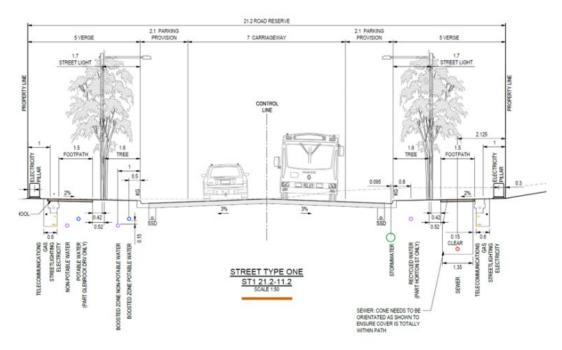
Proposed road section at Observer Street, Glenrock Drive, Harvest Street, and Horton Street (Googong Neighbourhood 2 Traffic Report, 2019).
